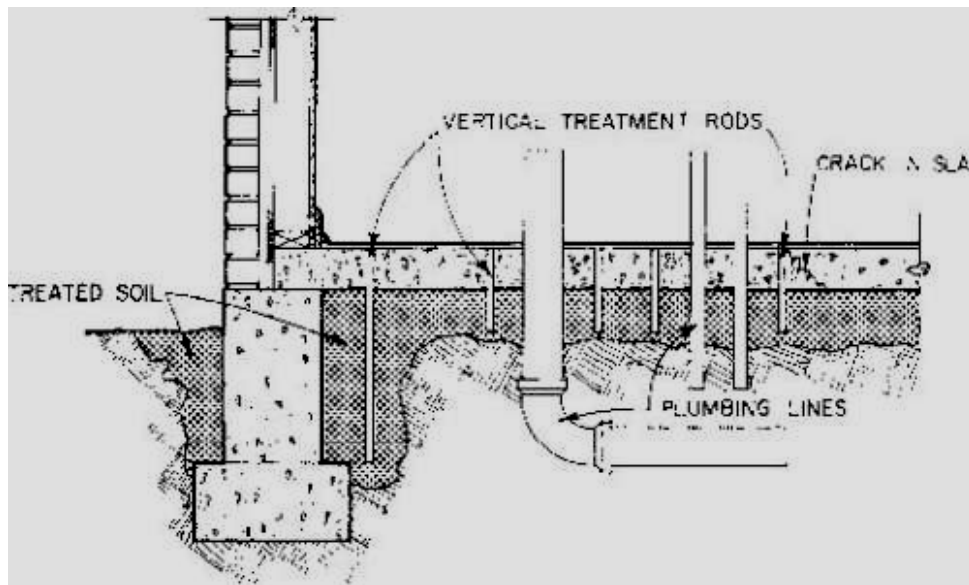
Treatment under concrete with vertical drilling at joints, cracks and openings, and around plumbing
